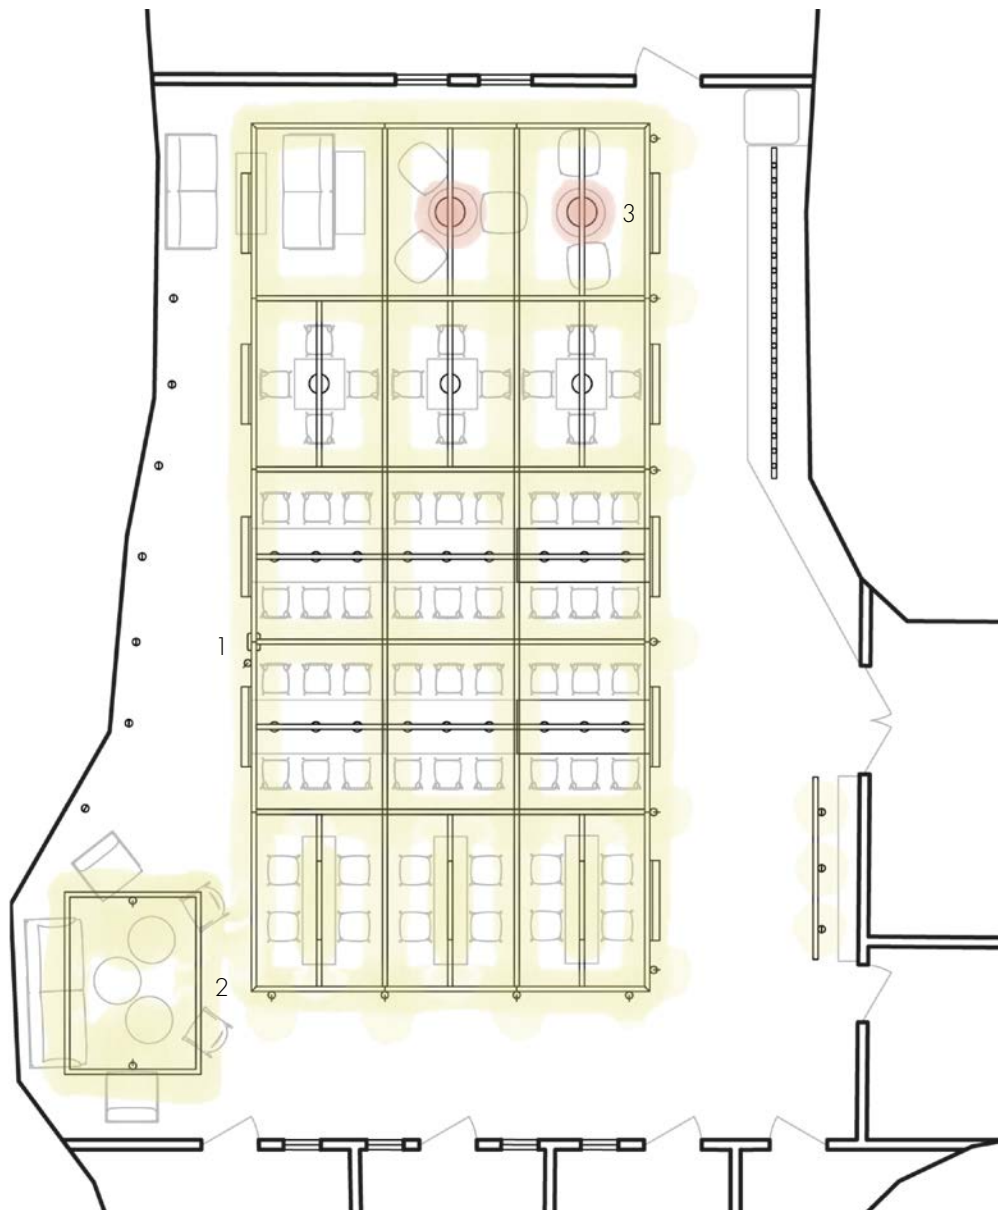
Sketch of lighting plan for scenario 2 in Retka
